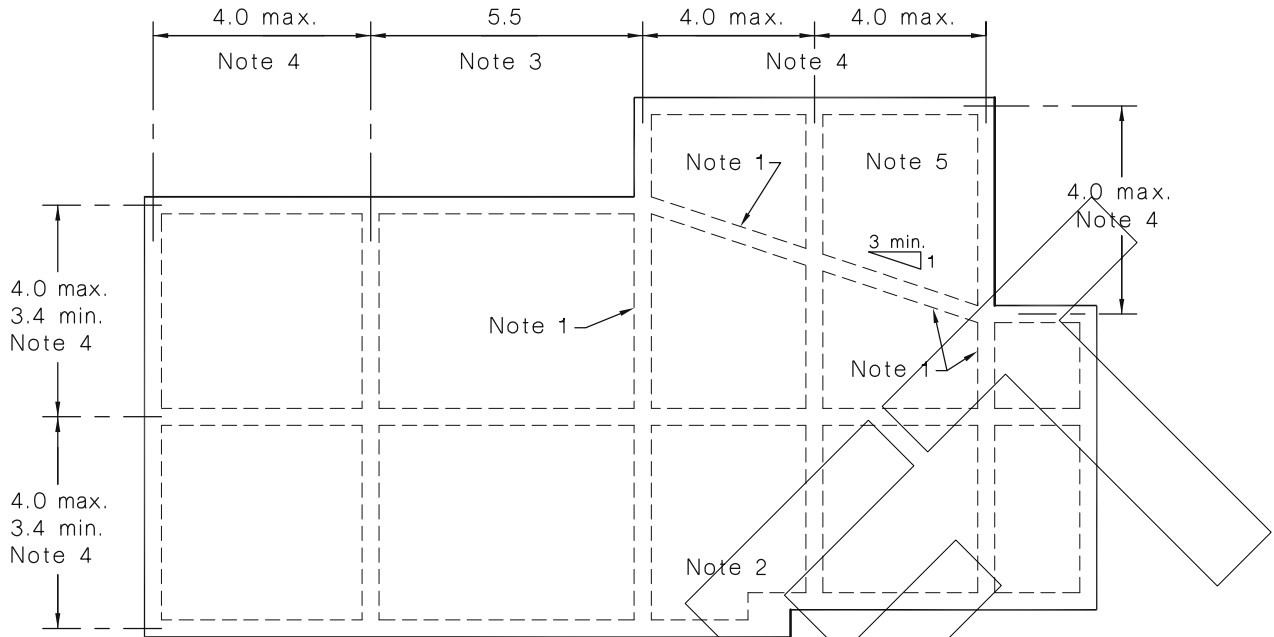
ARRANGEMENT OF STIFFENING BEAMS
